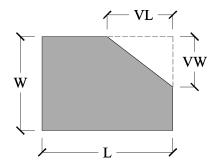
Parameters to define the size of a SIM card shape room in floor plan.
